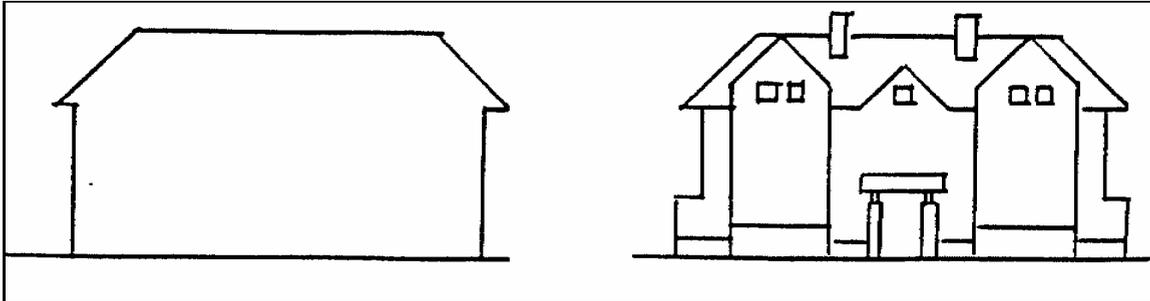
Schematic elevation sketches of two multi-storied buildings with equal heights and widths. Architectural details such as porches, windows, and roof dormers articulate a buildings facade (right) which enhances visual quality and contributes to a human-scaled development.
